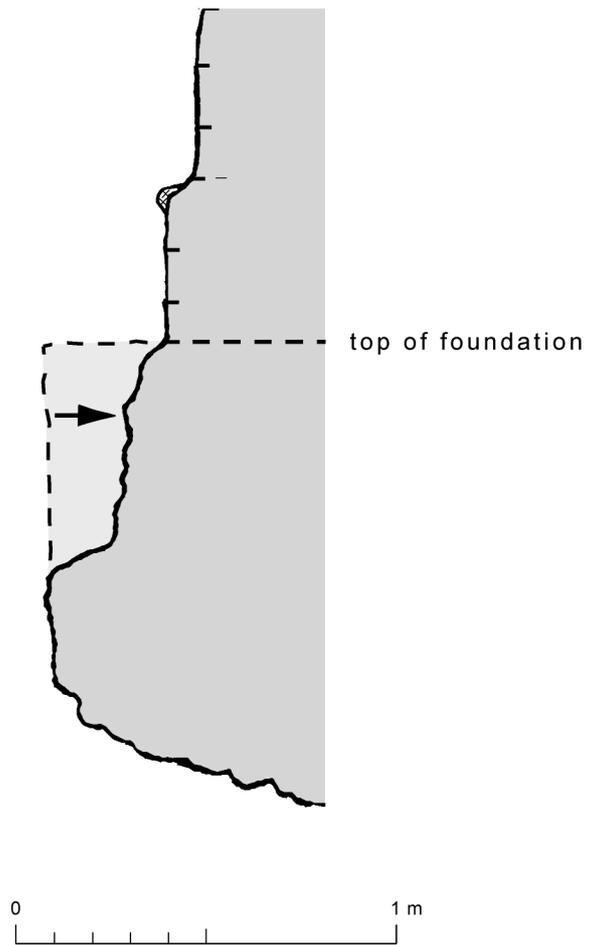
Hypothetical reconstruction of the outline of the town wall foundation, showing how it might have been distorted during construction.
